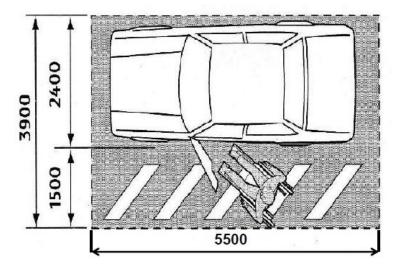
Barrier- Free Parking Space Dimensions – single space
